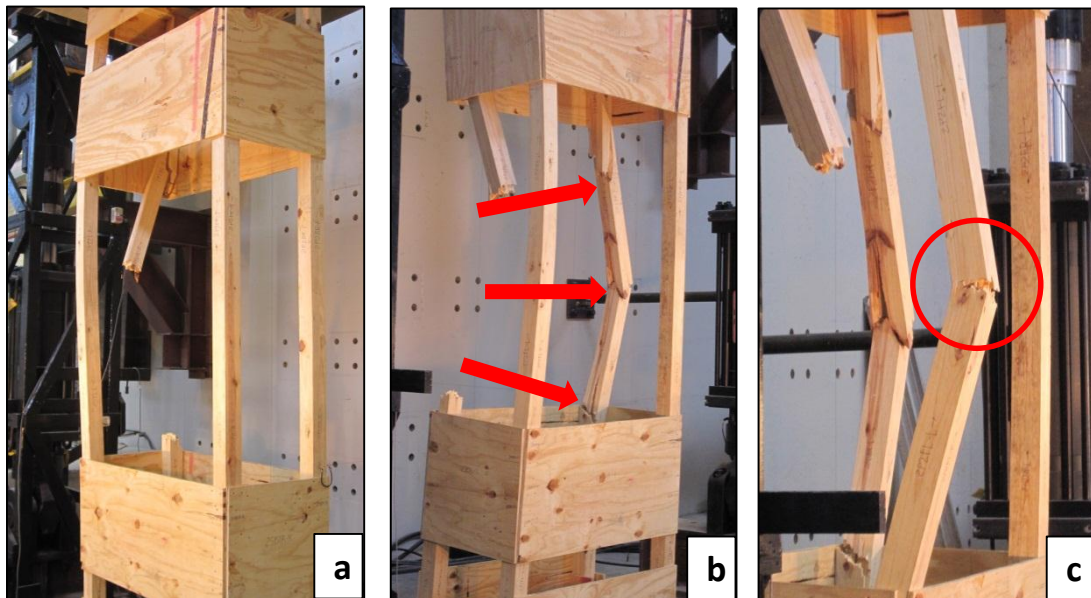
Specimen 2 (a) First failure (b) Second failure (c) Third failure
